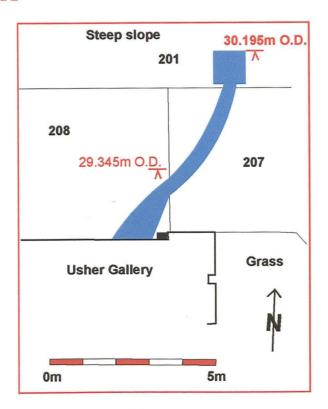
Detailed location of camera positions A and B. Sky blue shows area excavated. (after plan provided by client)
